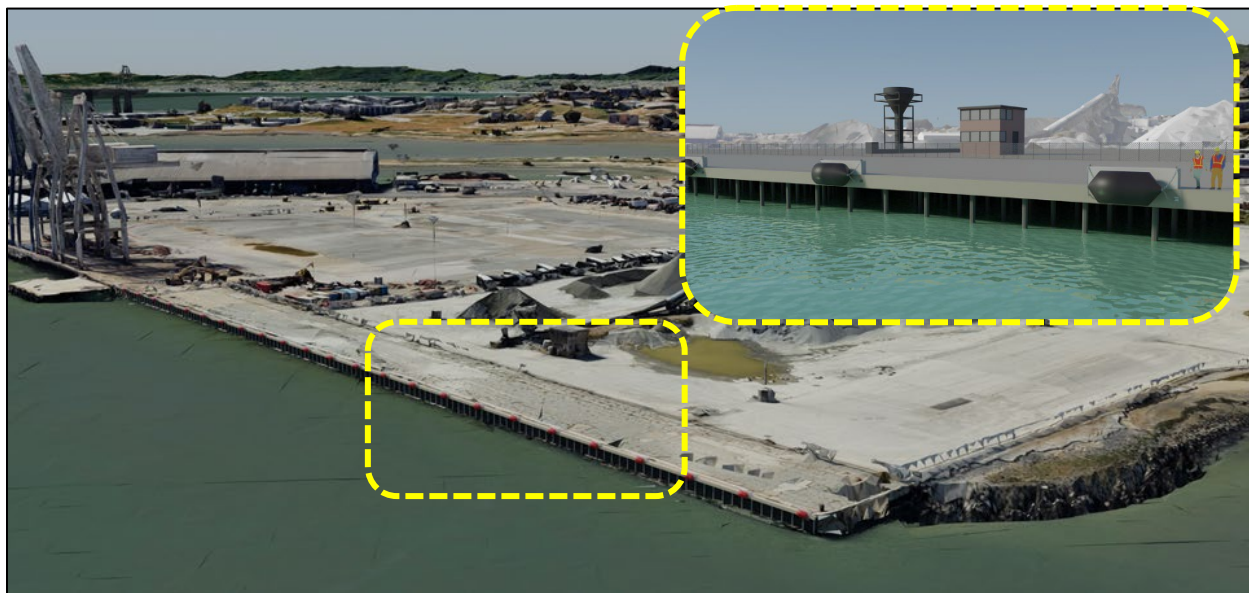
Pier 94 Mooring and Fendering – Post-Project
